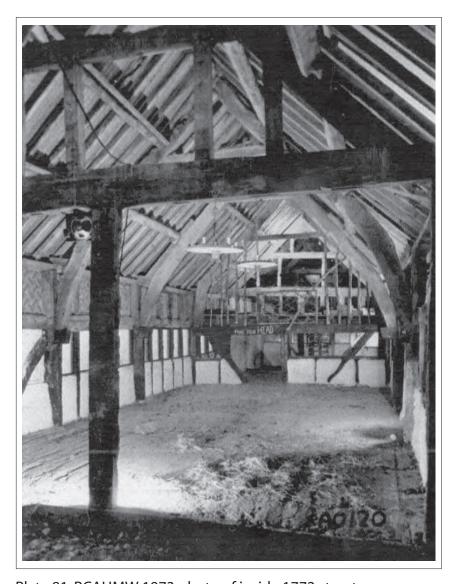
RCAHMW 1973 photo of inside 1772 structure
